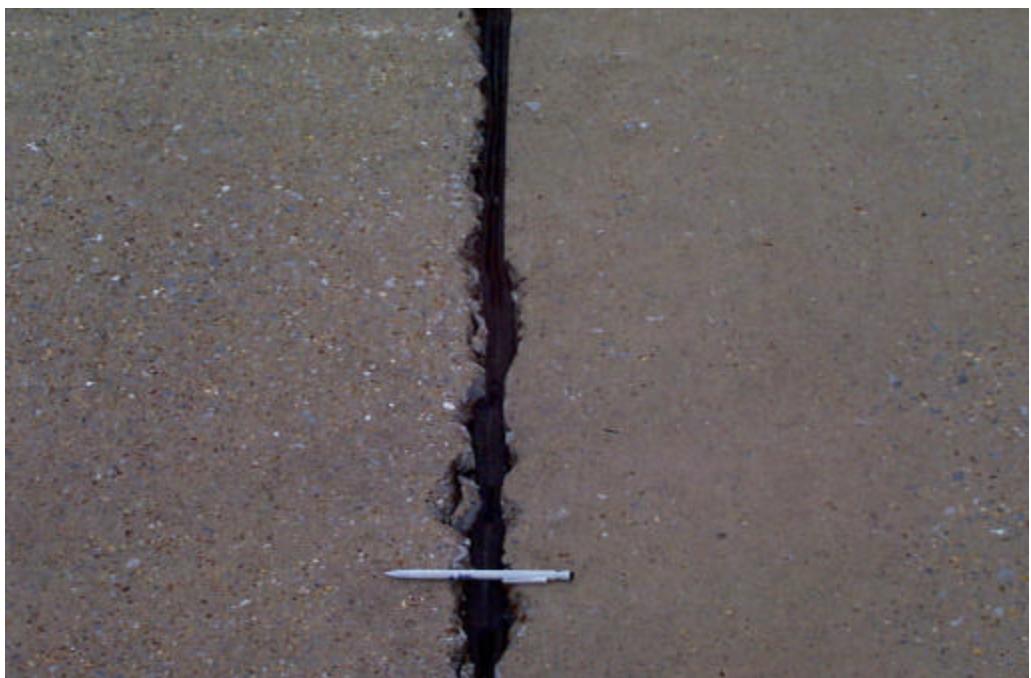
Runway 03/21, Feature R10A, typical raveling at joint.
